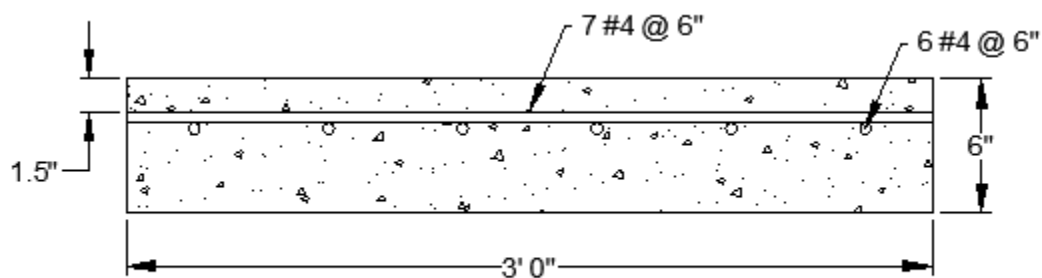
RC specimen layout. (Note: 1 in.=25.4 mm, 1ft=304.8 mm)
